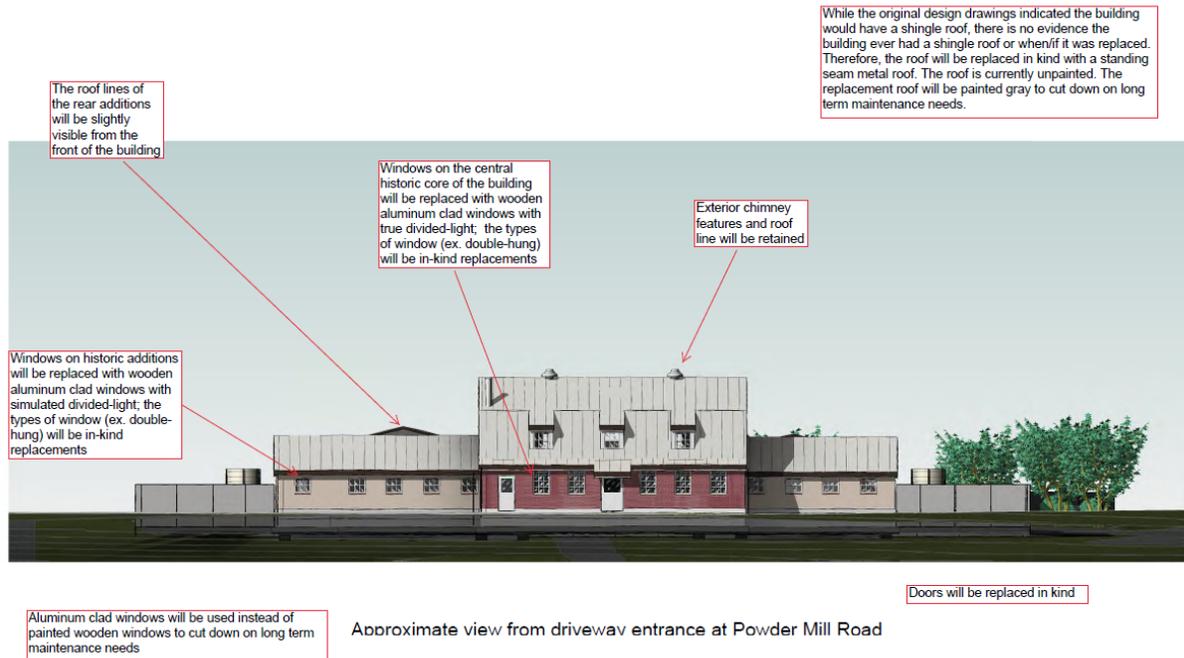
Main Elevations of the proposed Poultry Quarantine House (Building 434)
